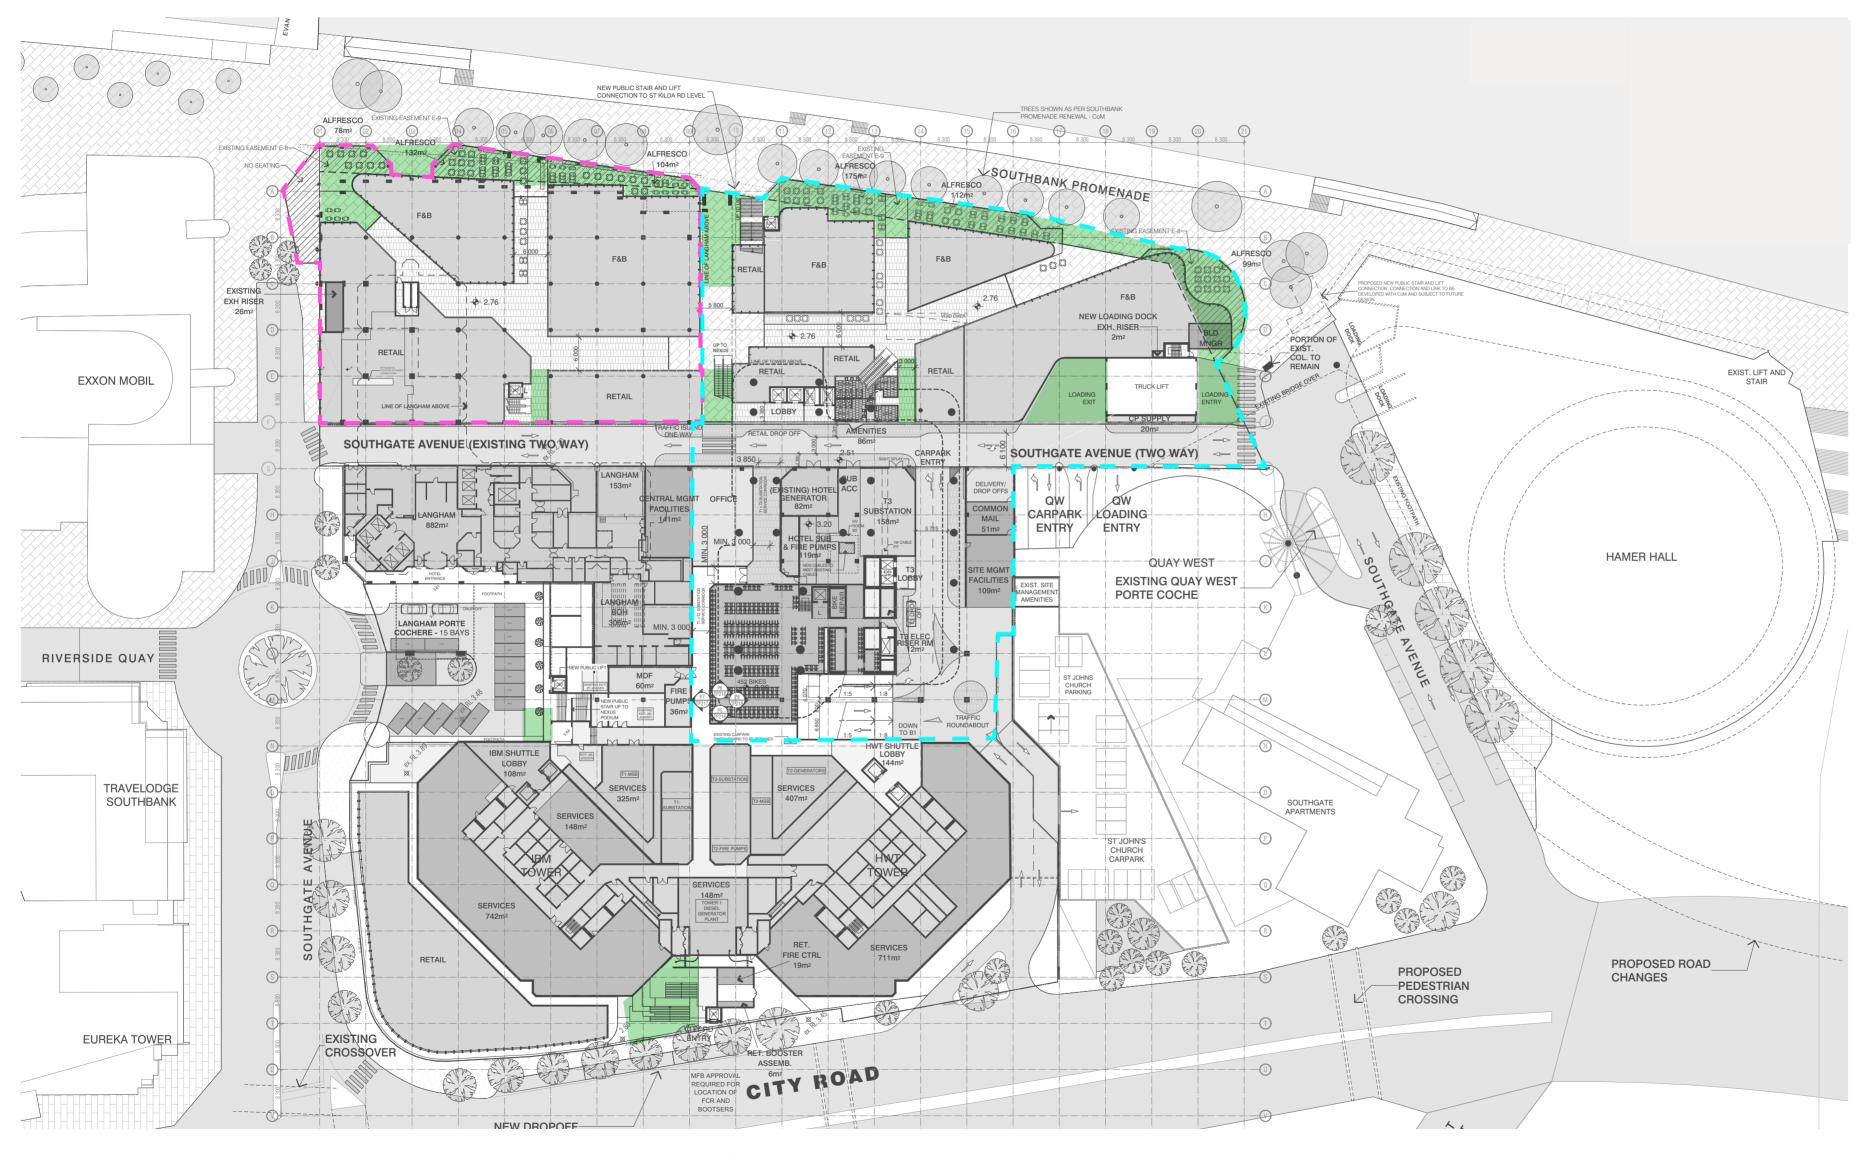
PROPOSED GROUND FLOOR PLAN WITH TRANSITION ZONES HIGHLIGHTED IN GREEN
